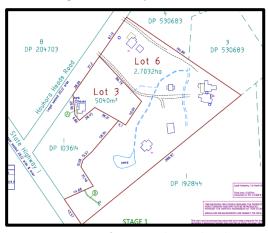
Snippet of Stage 1 scheme plan showing locations and number of dwellings within each proposed lot.
